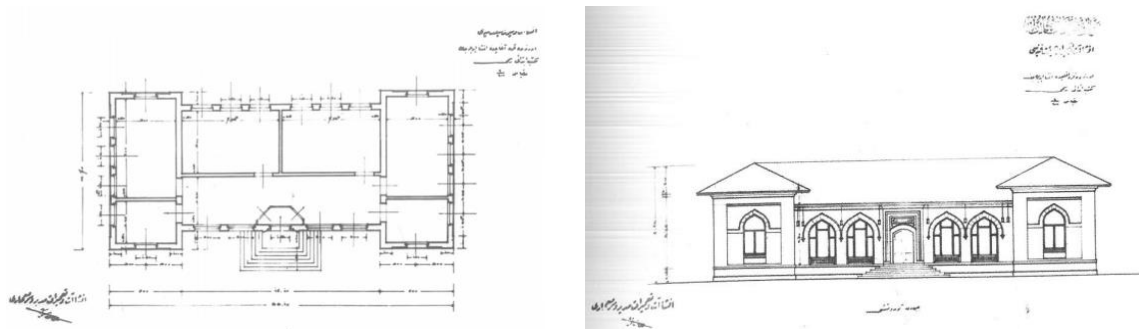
a) Karaağaç Primary School Ground Floor Plan, b) Karaağaç Primary School Front Facade [42]
